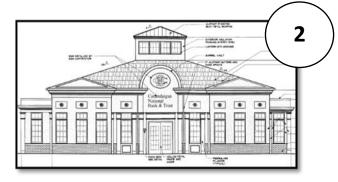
Through ongoing discussions with Zoning staff, the project's architect returned with the second proposal for the Canandaigua National Bank. While improved with additional height (it was now at 18 feet, 6 inches), the design still included a pitched roof and cupola. Design staff in the Zoning office felt that this exhibited an informal, residential, almost nautical feel to the building and was out of place among the more formal commercial buildings around it.
